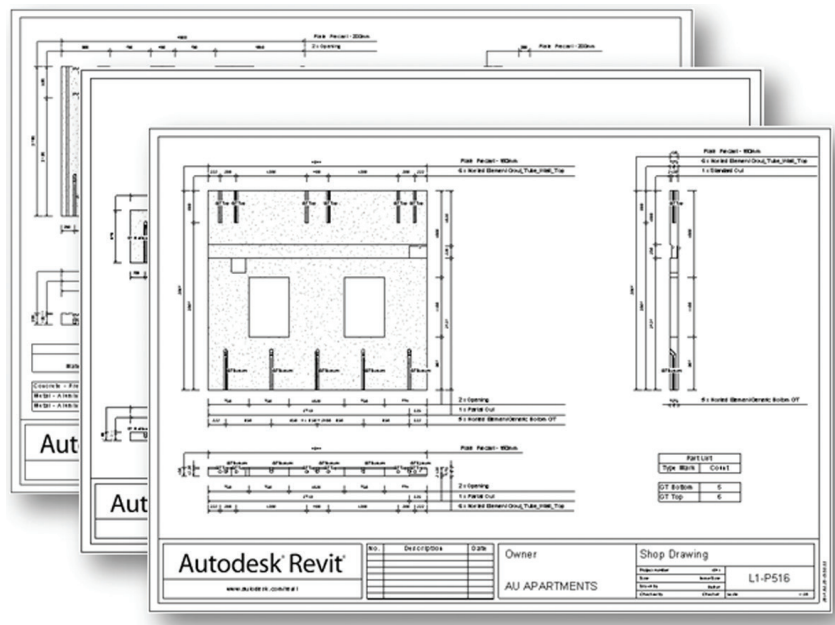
Autodesk Revit workshop, Smart Assemblies sheets
